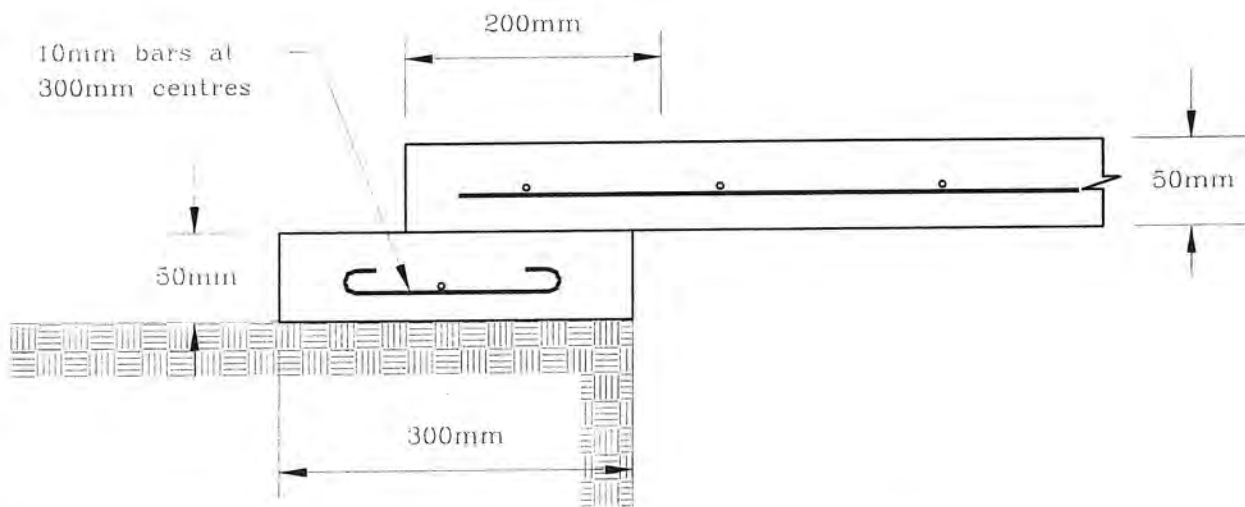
3A DETAILS OF SQUAT TYPE COVER SLAB
